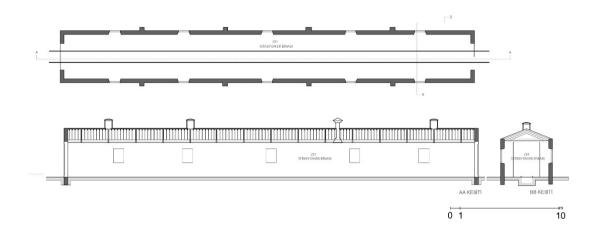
Drawings of Cer Building (Sinan, 2019)
